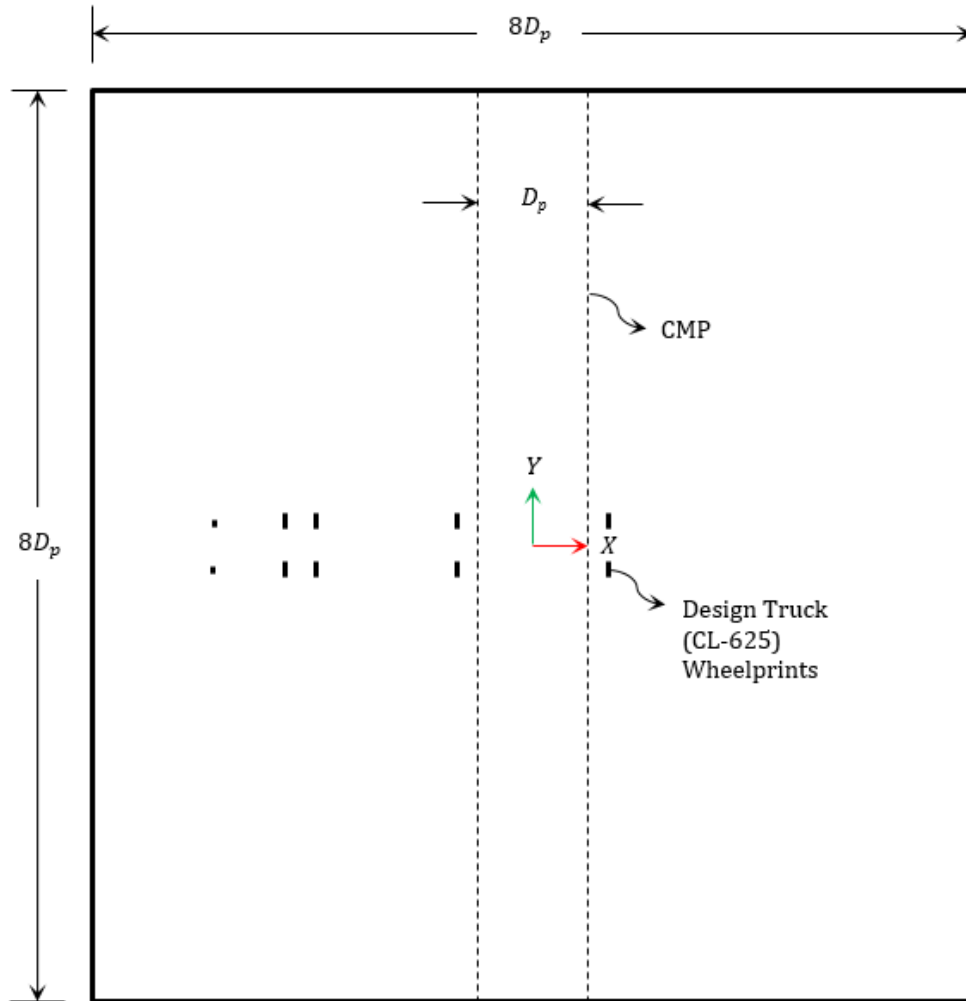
Plan view schematic of 3D finite element model geometry.
